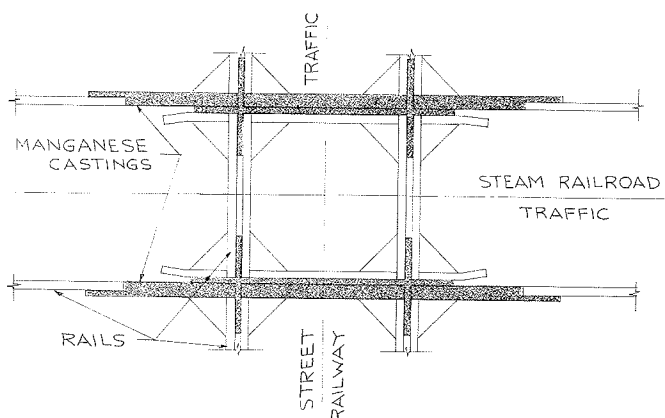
First manganese steel crossing installed in track (stream railway crossing electric railway)—installed in 1899.
